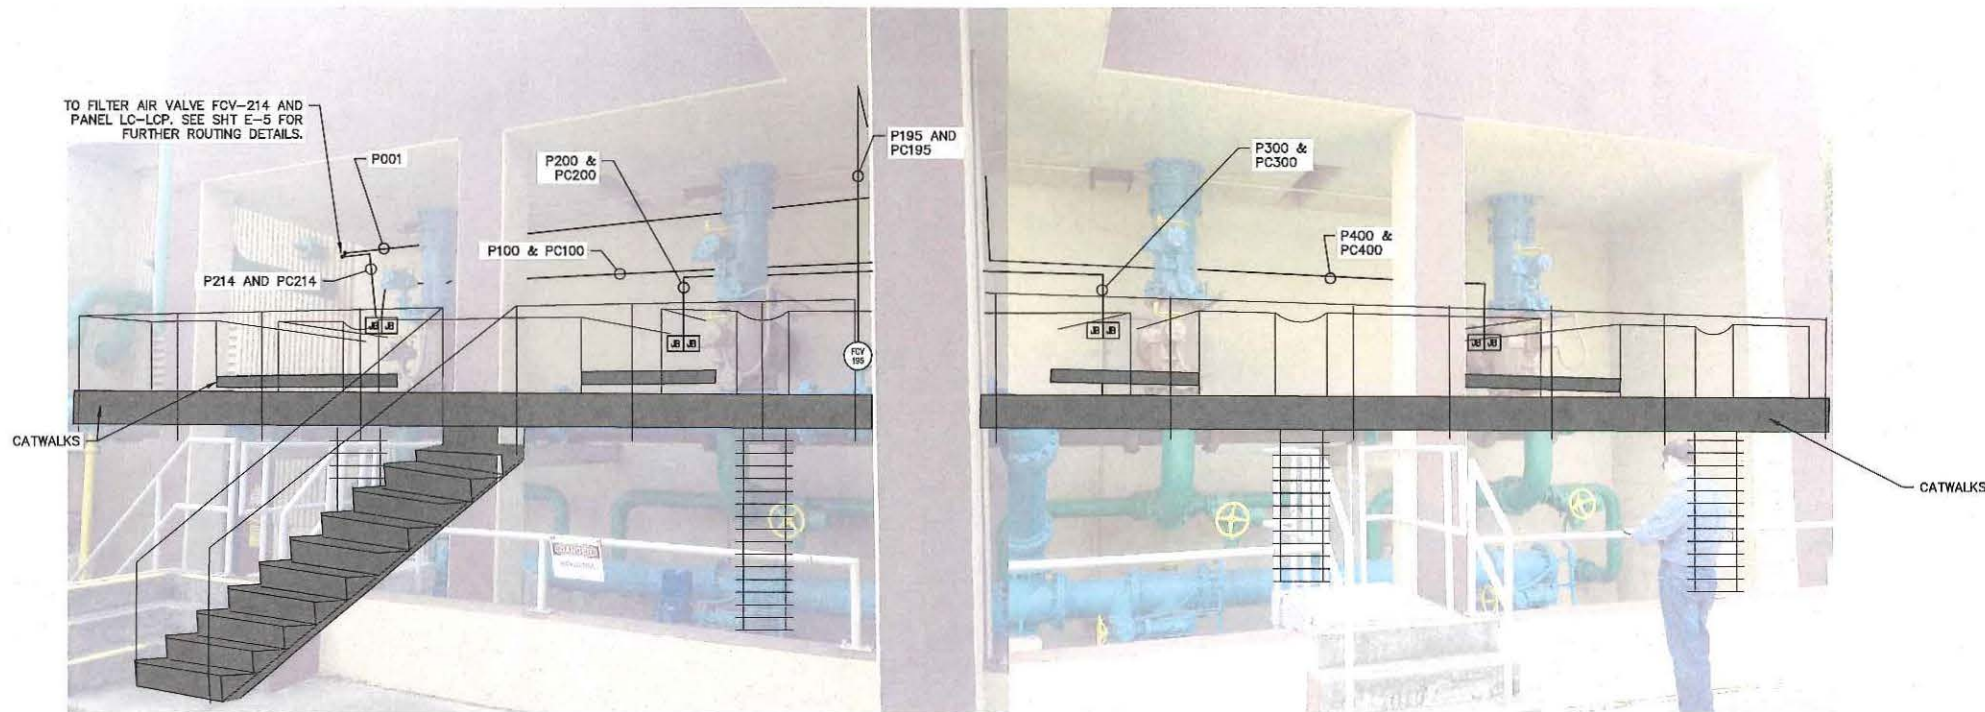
PHOTO  FILTER GALLERY CONTROL VALVE - CONDUIT PLAN I
